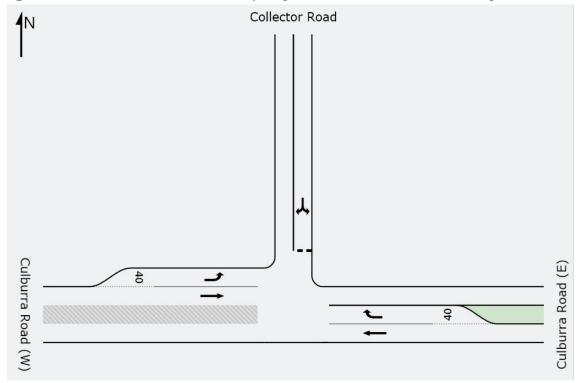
Culburra Road/Collector Road - priority controlled intersection schematic layout
